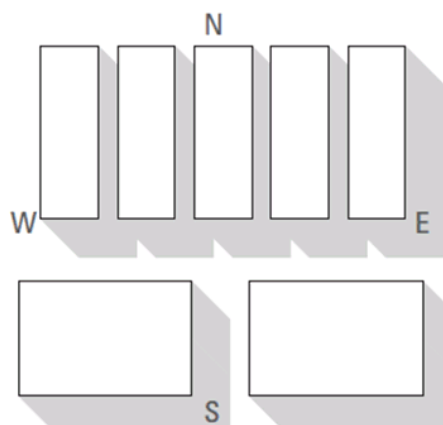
Narrow lots oriented along a north-south axis provide shade on the east and west walls of neighbouring lots. Wider lots should be oriented east-west to minimise the area of exposed wall on the eastern and western facades.
